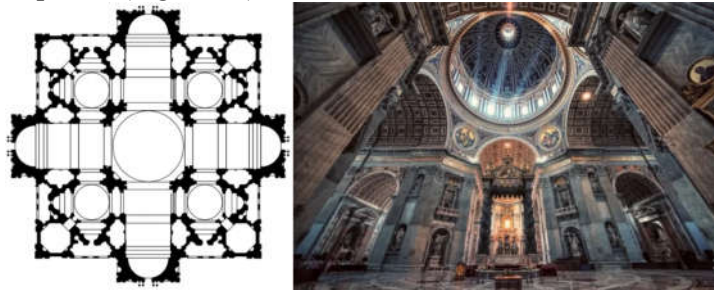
St. Peter Church, Plan & Interior (www.stpeterchurch.com)
